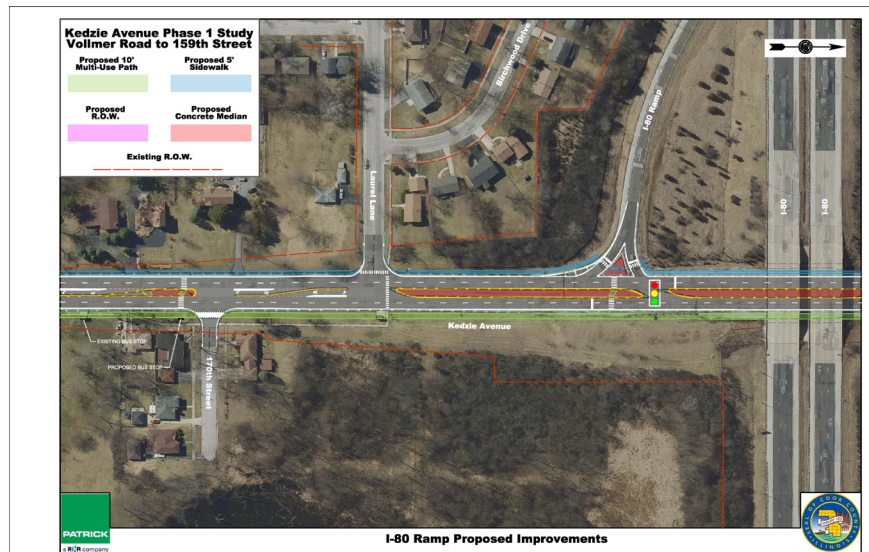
Initial Alternative - I-80 Ramp Exit Ramp.
